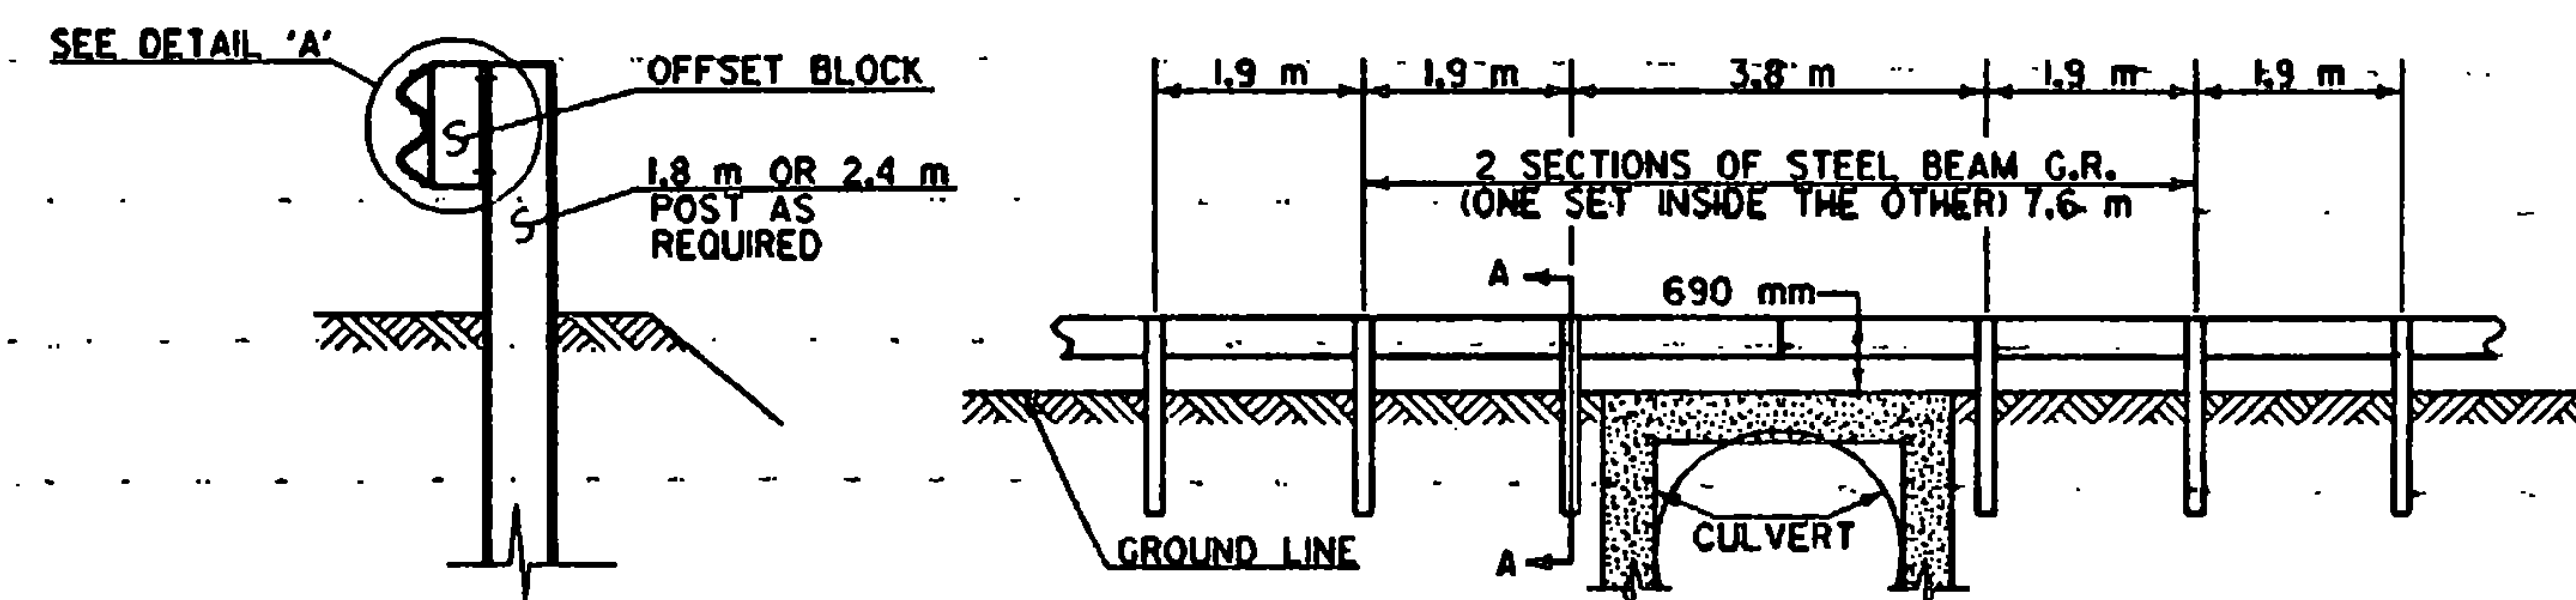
DETAIL OF STEEL BEAM GUARD RAIL AT LARGE CULVERTS
